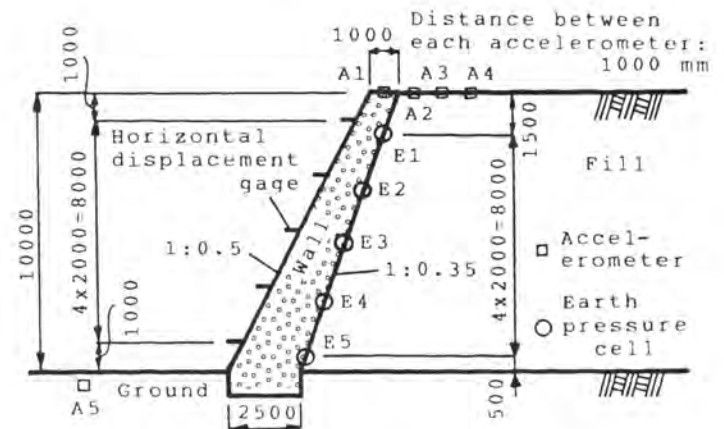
Cross Section of Retaining Wall and Arrangement of Gages
